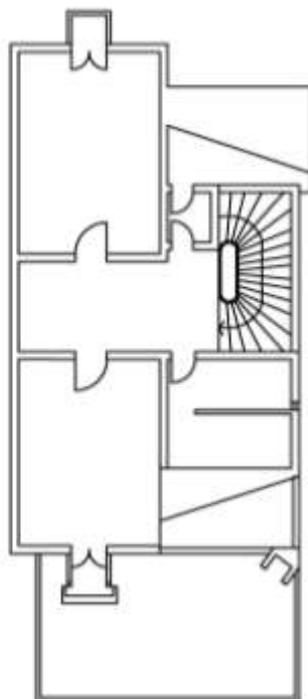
Second floor plan of the house at 124 lot 3 parcel
